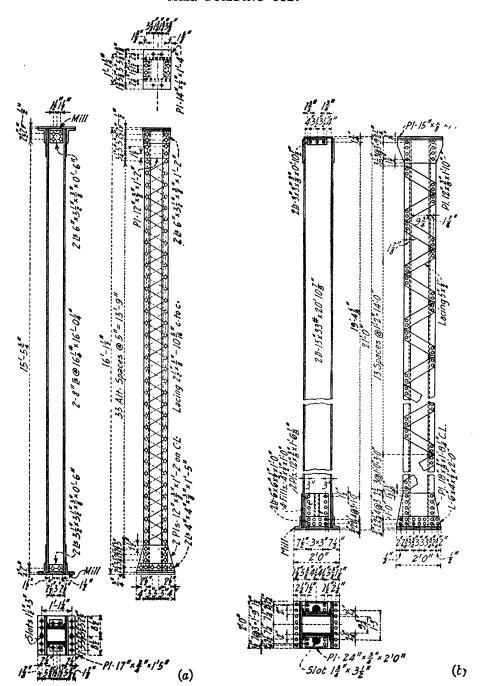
DETAILS OF MILL BUILDING COLUMNS.
